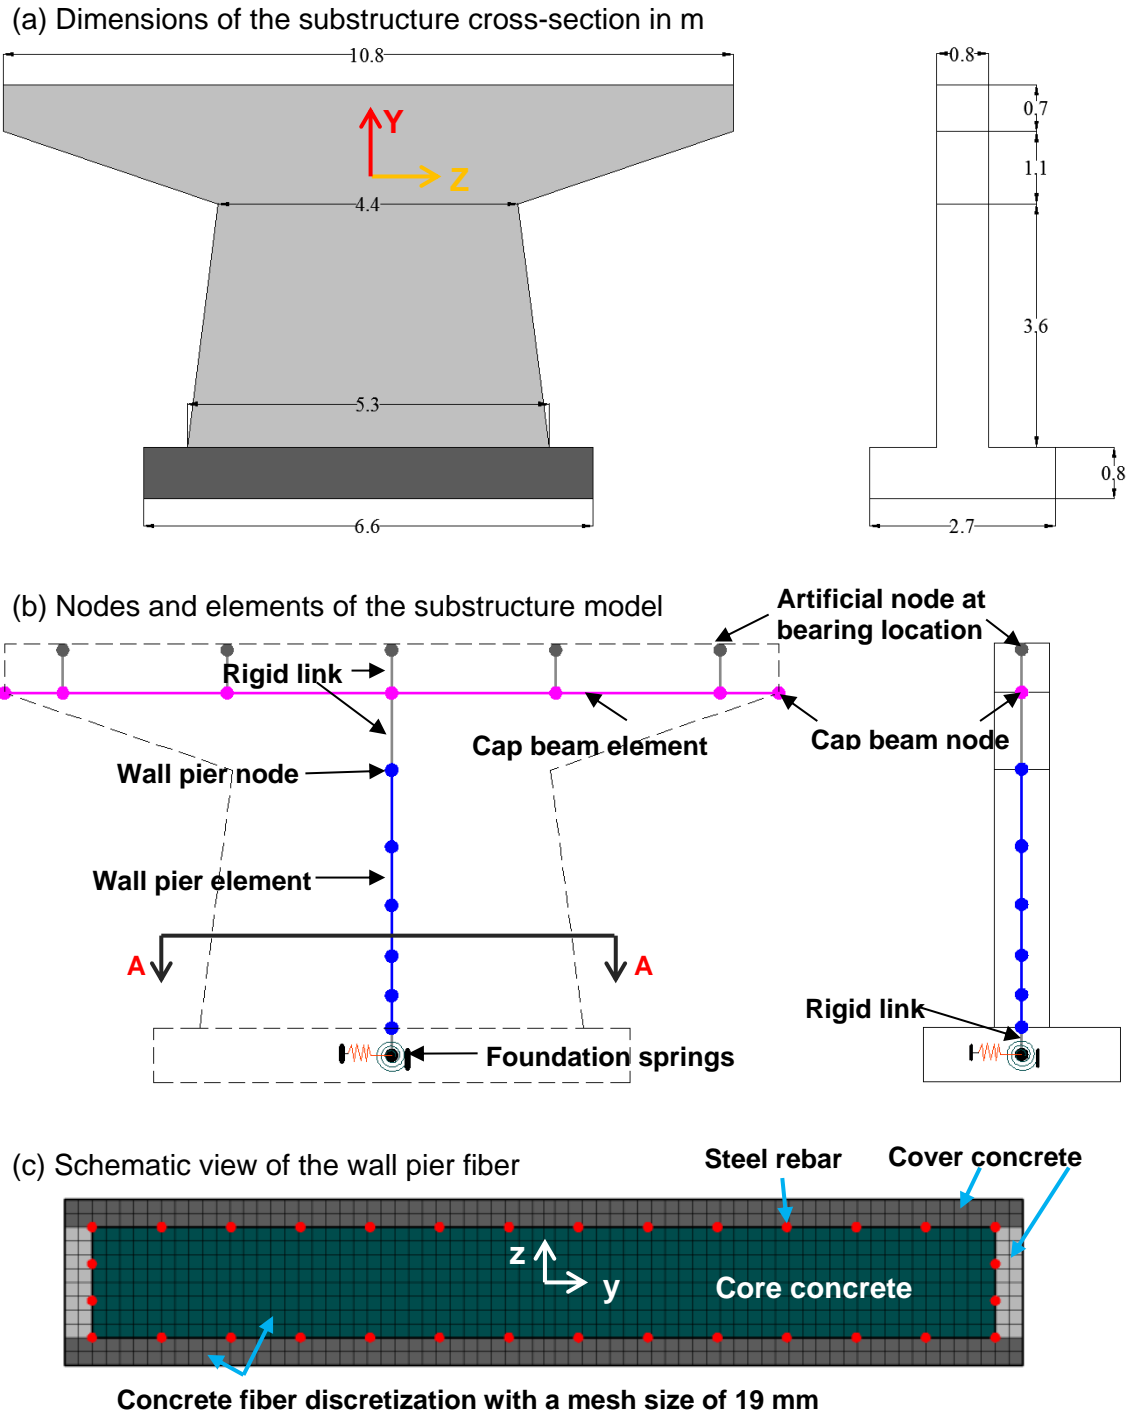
Schematic view of the substructure model and fiber section discretization of the cap beam and wall pier
